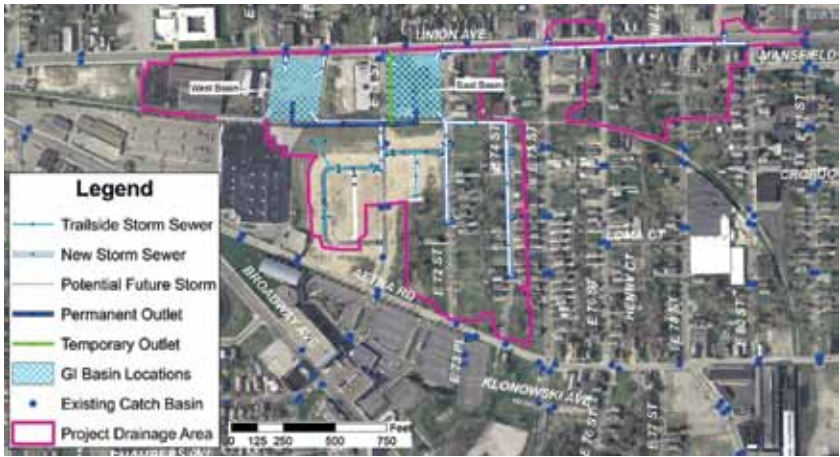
Slavic Village–Union (SVU) Avenue recommended plan
